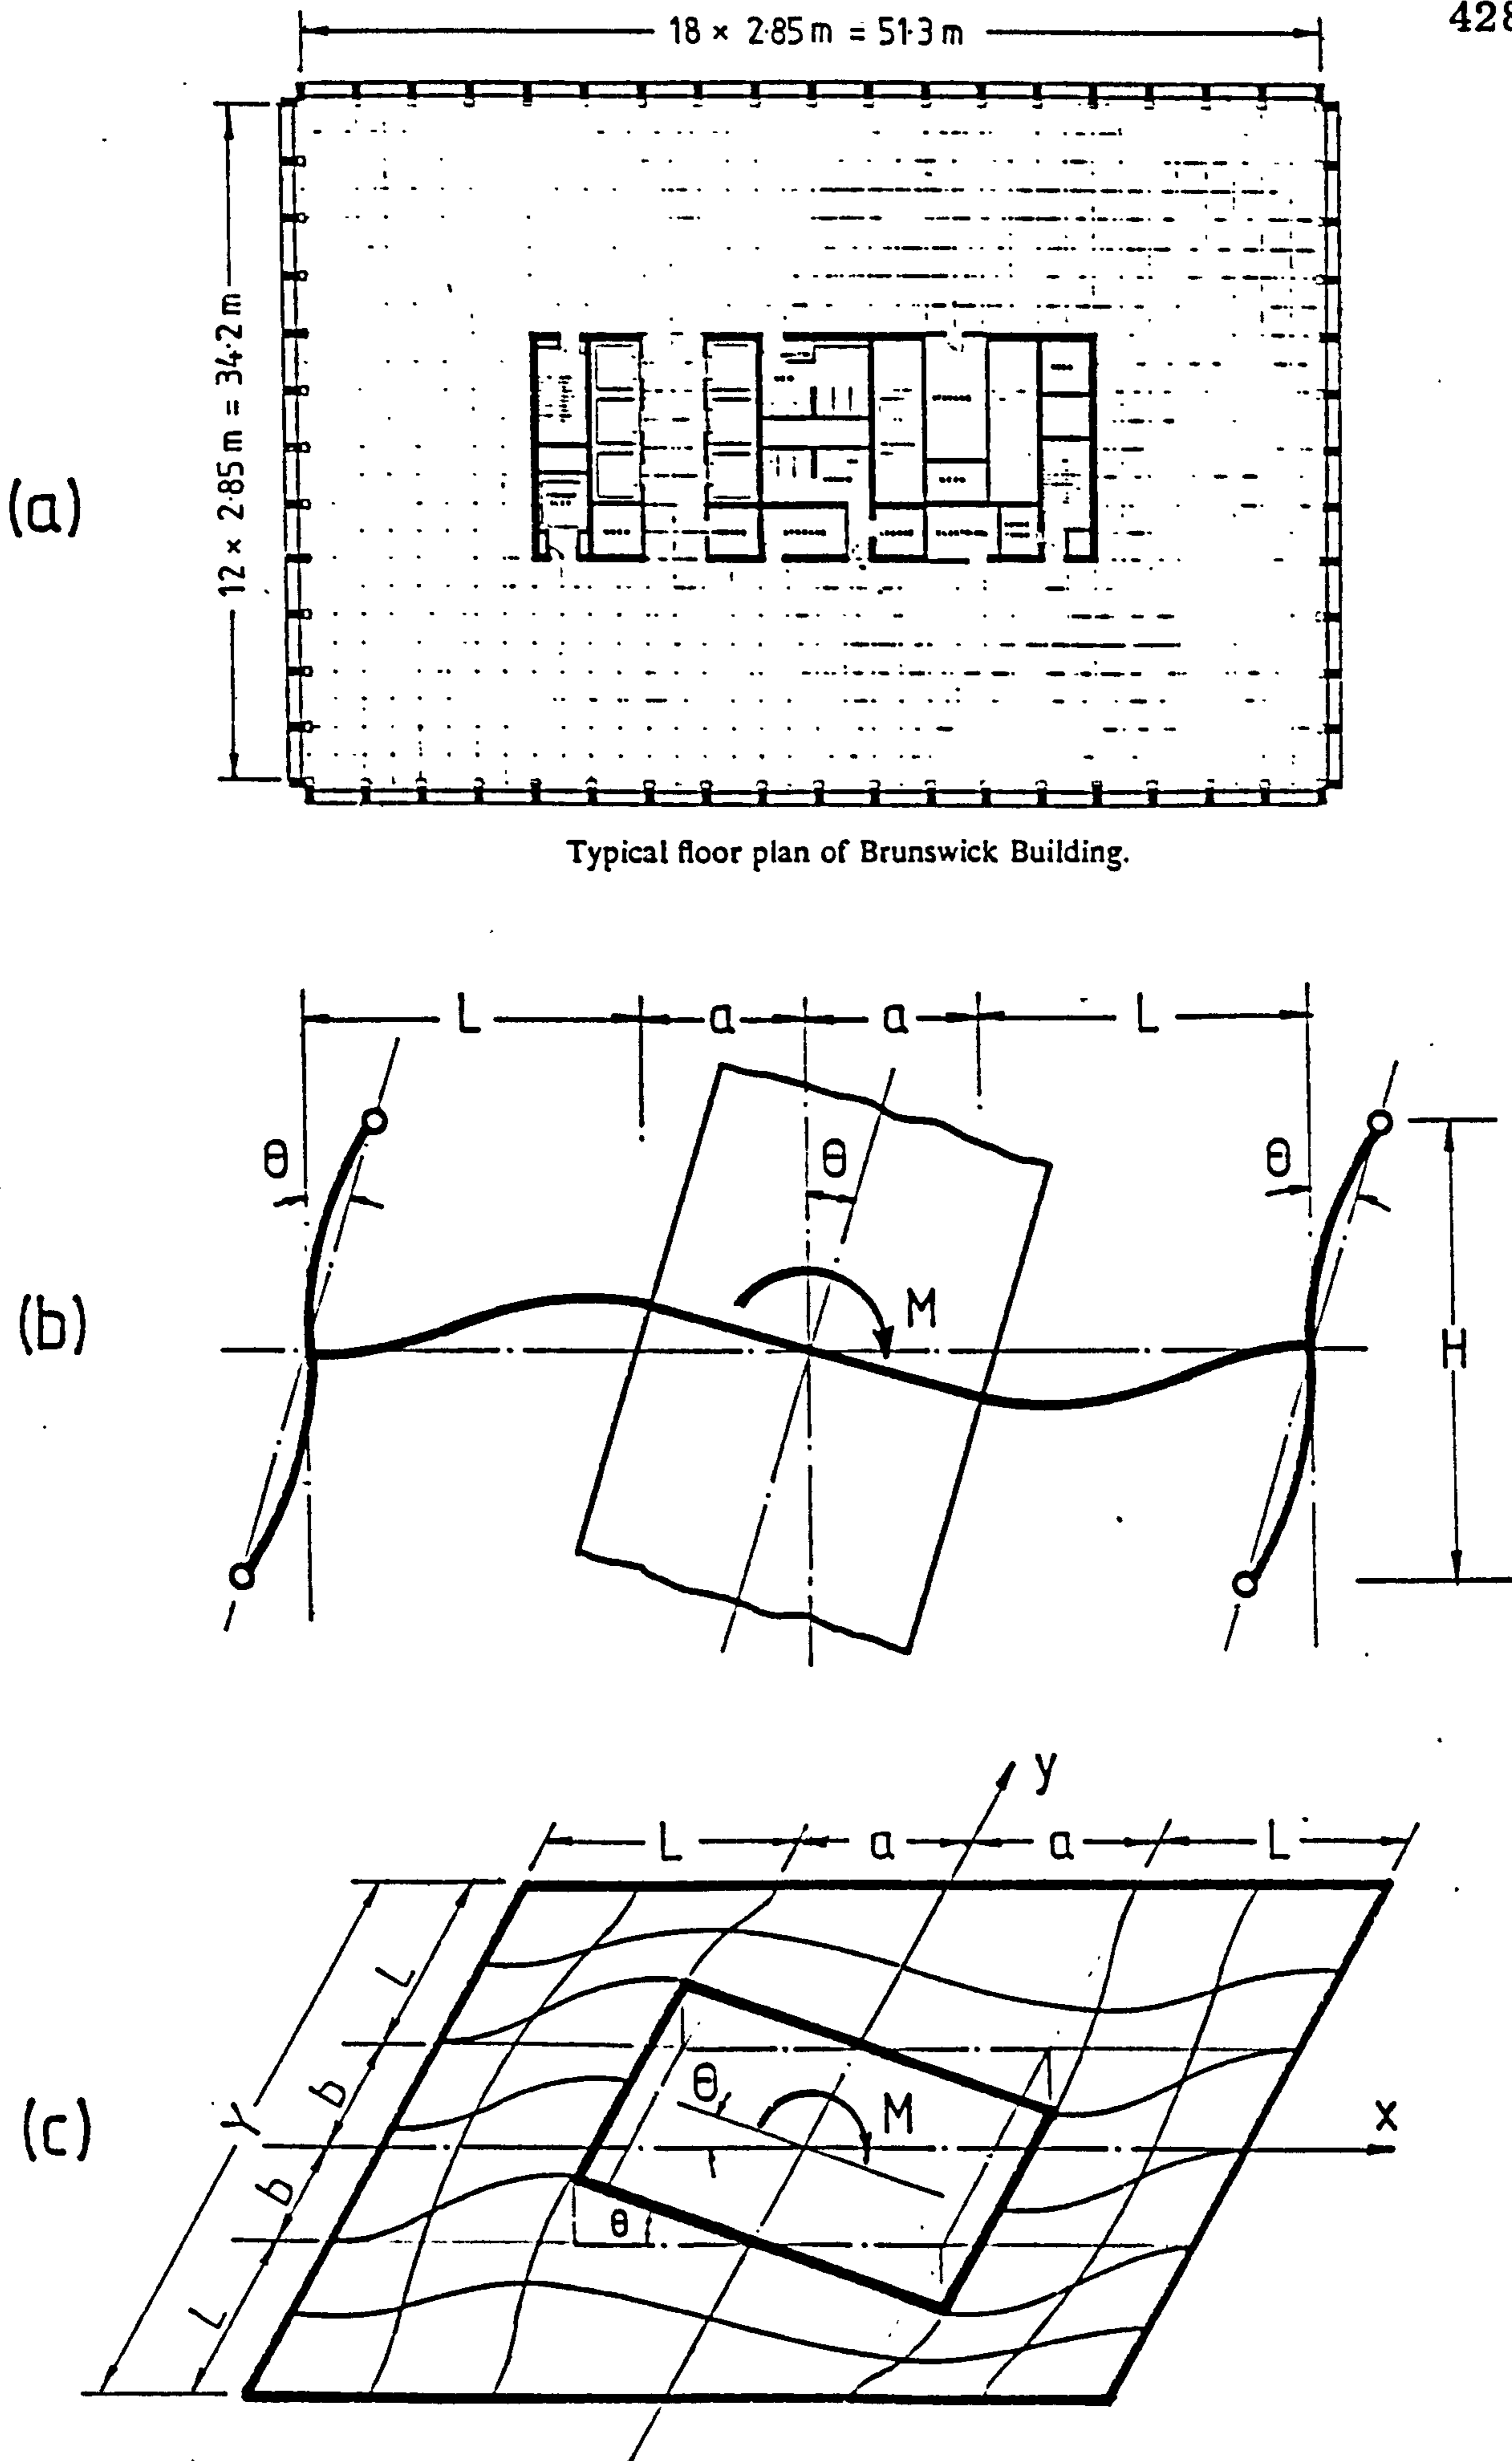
Hull Core Structure (a) Typical Floor Plan, (b) Lateral Deformation Characteristics, and (c) Floor Deformation
